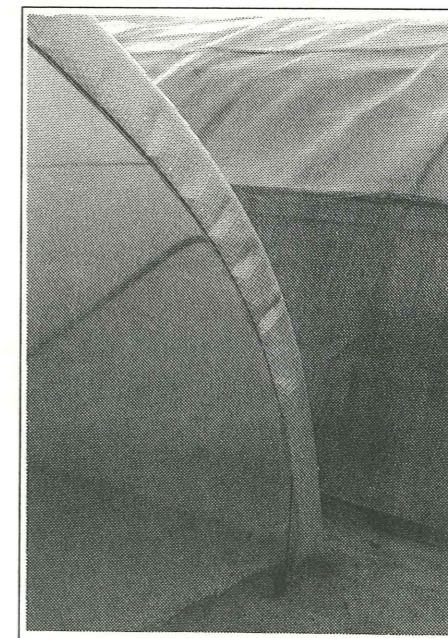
The plastic sheeting is stretched over the tunnelhouse frame by the weight of soil on the sheeting, which is placed into a 300 mm deep trench at the perimeter of the tunnelhouse
